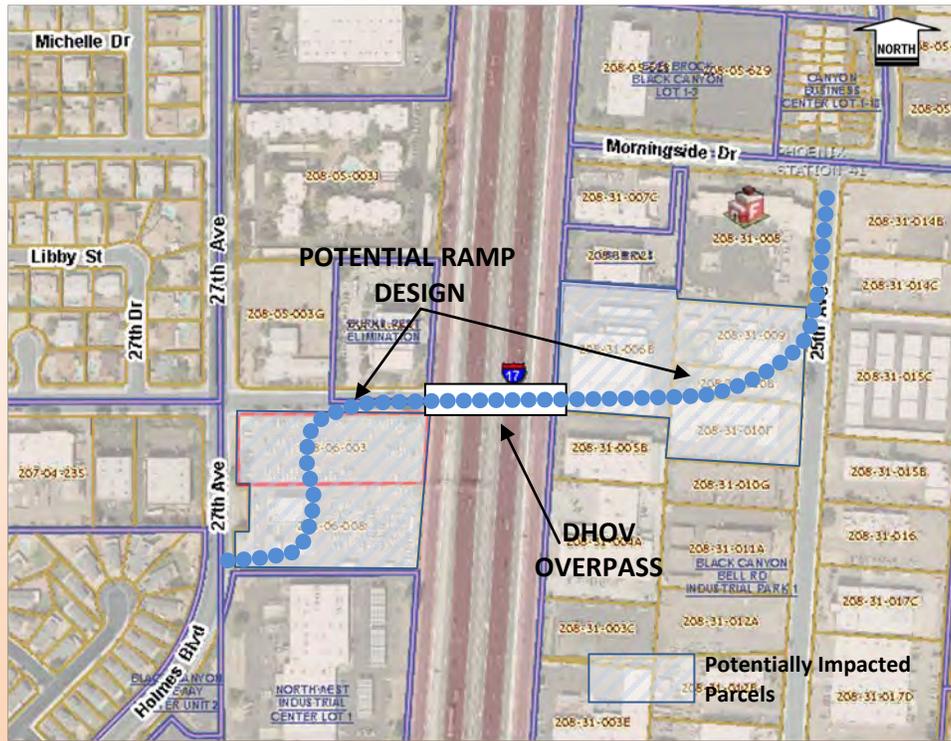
A – POTENTIAL DHOV ACCESS RAMPS DESIGN AT W. GROVERS AVENUE
